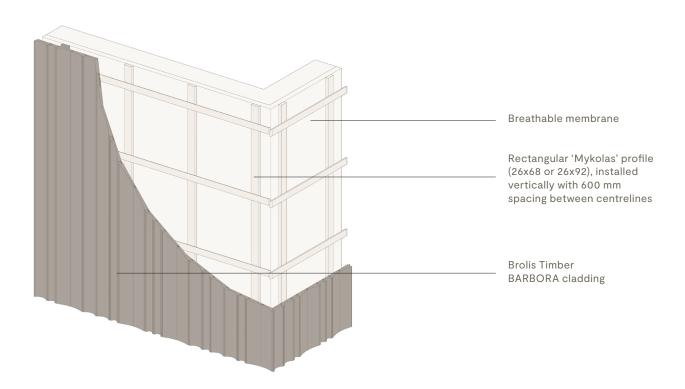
Internal corner when installing cladding panels with non grooved profiles
